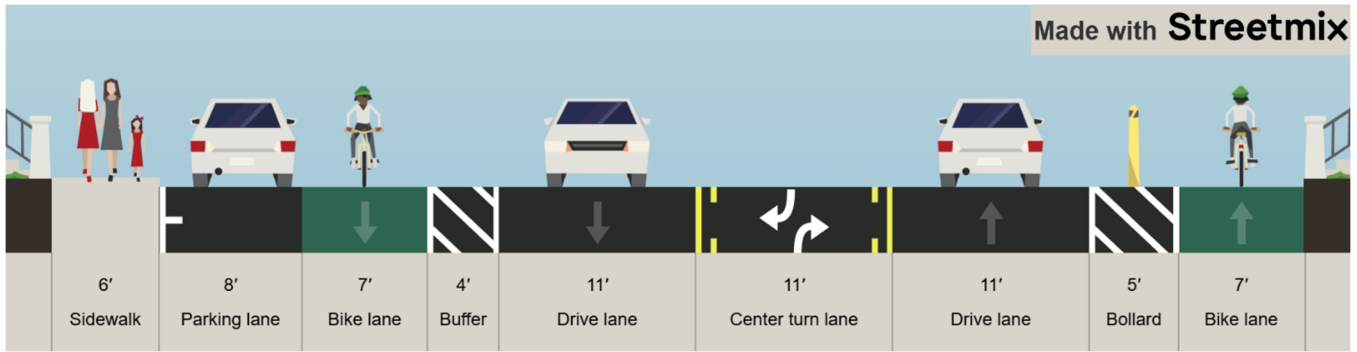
Potential road diet cross section for Moraga Road between Corliss Dr and Donald Dr. Created using Streetmix.
